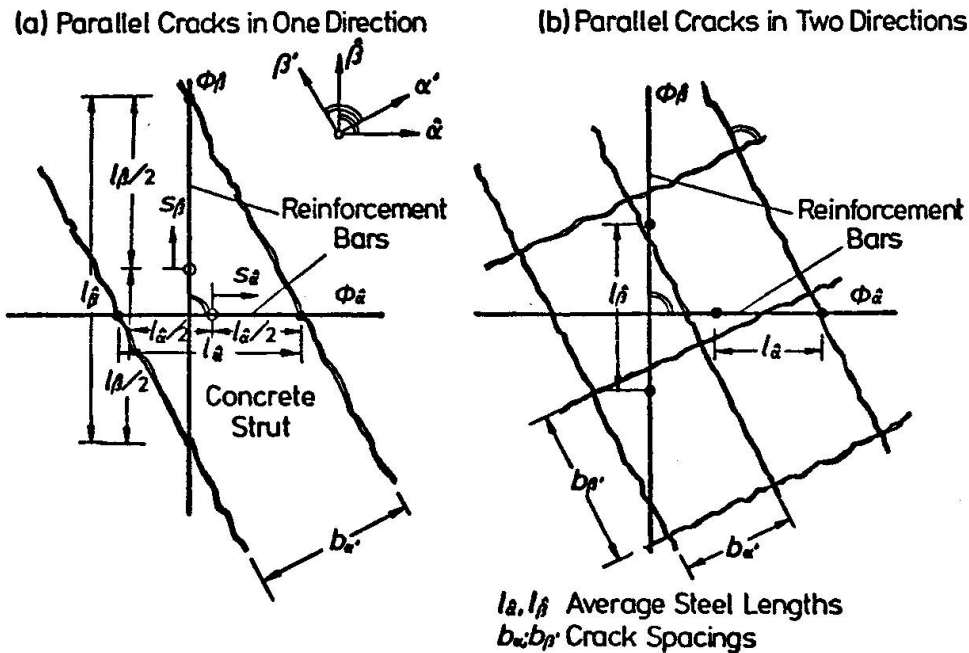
Reinforcement Bars Intersecting Crack Bands in One or Two Directions
